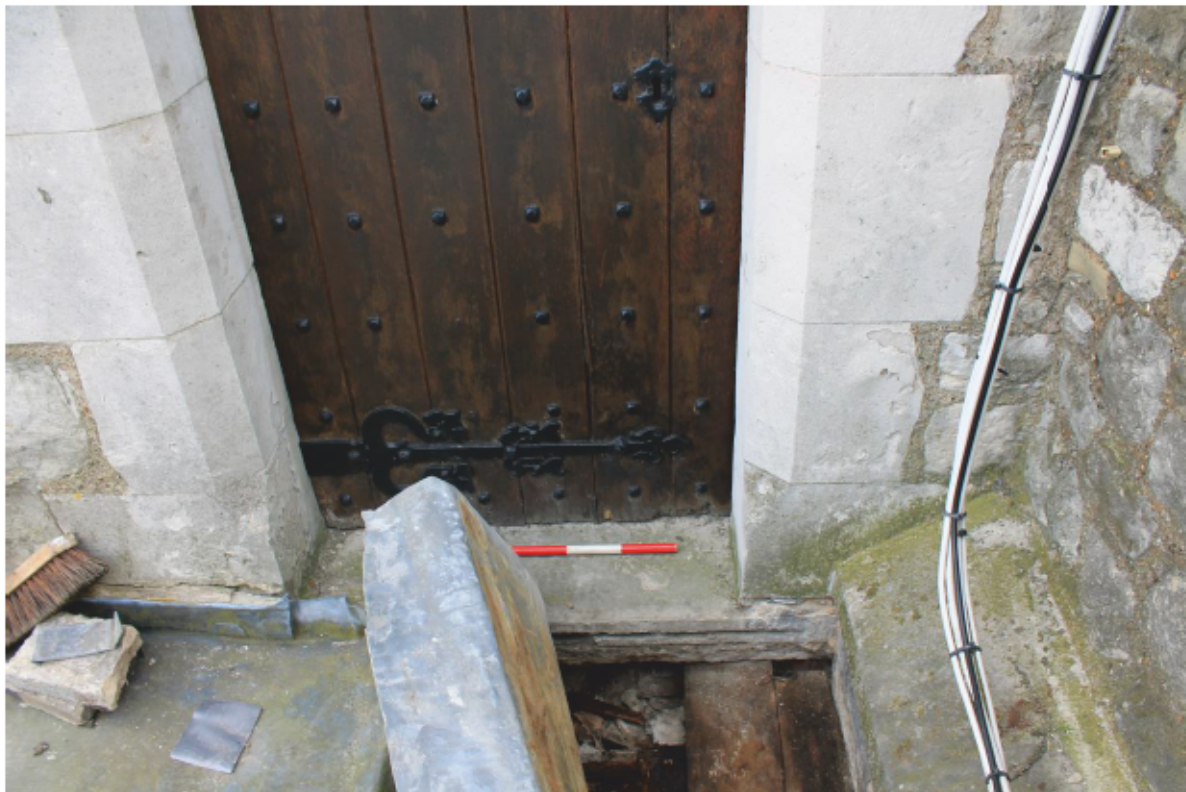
Roof of the Broad Arrow Tower showing location of joist (below leadwork) looking south
